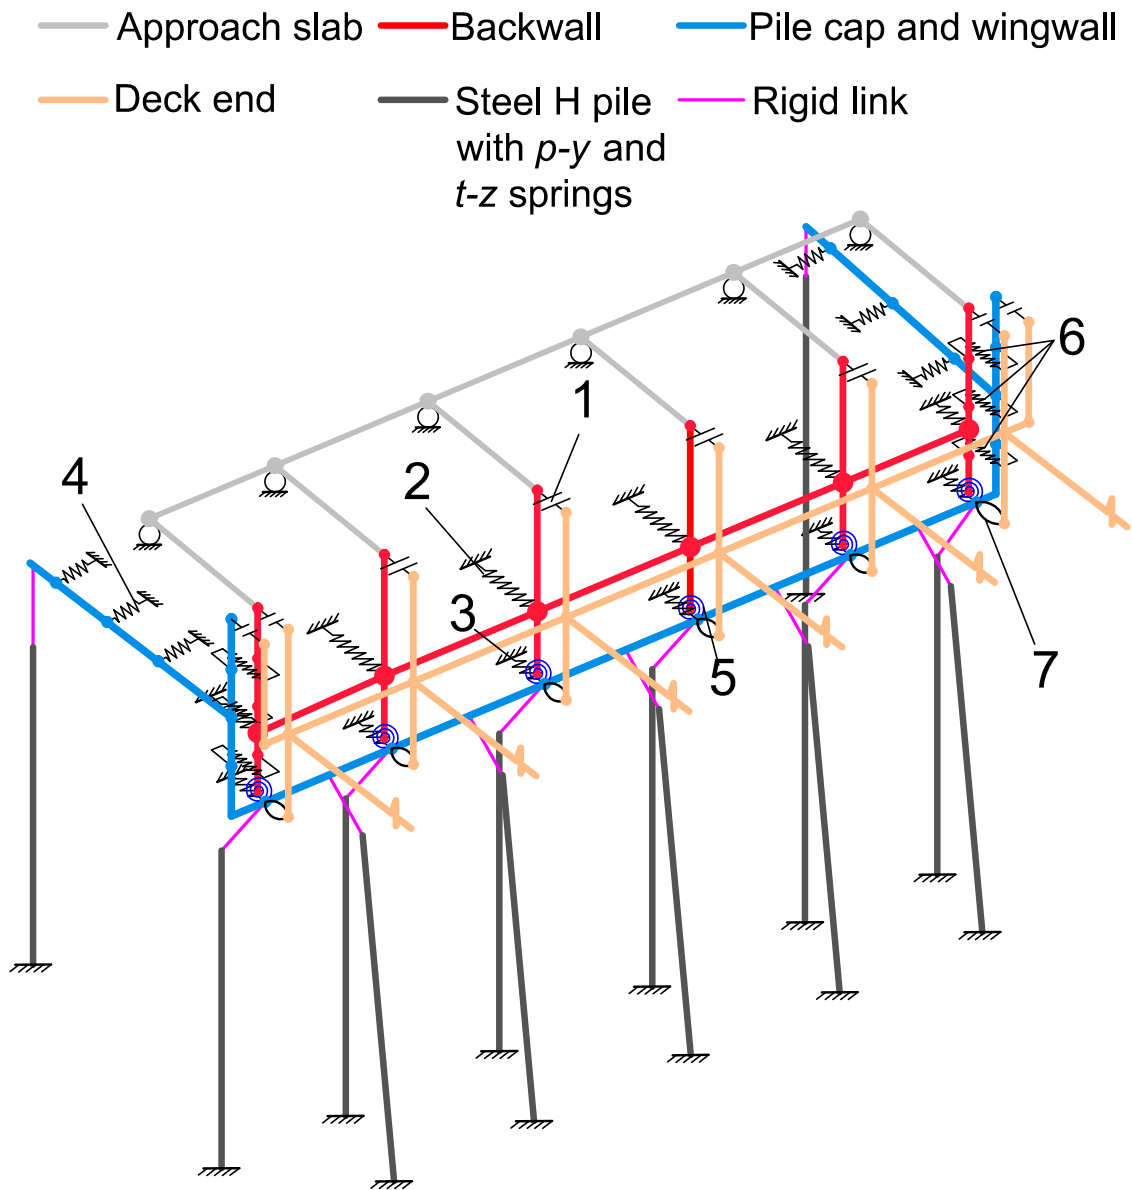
A 3-D finite-element model for the typical seat-type bridge abutment shown in Figure 4.1
